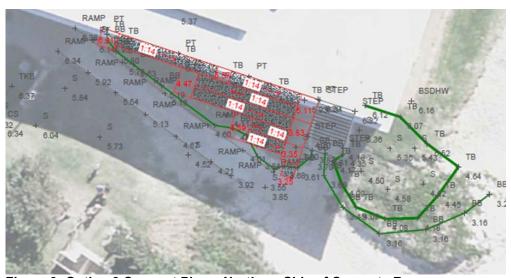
Option 3 Concept Plan - Northern Side of Concrete Ramp
